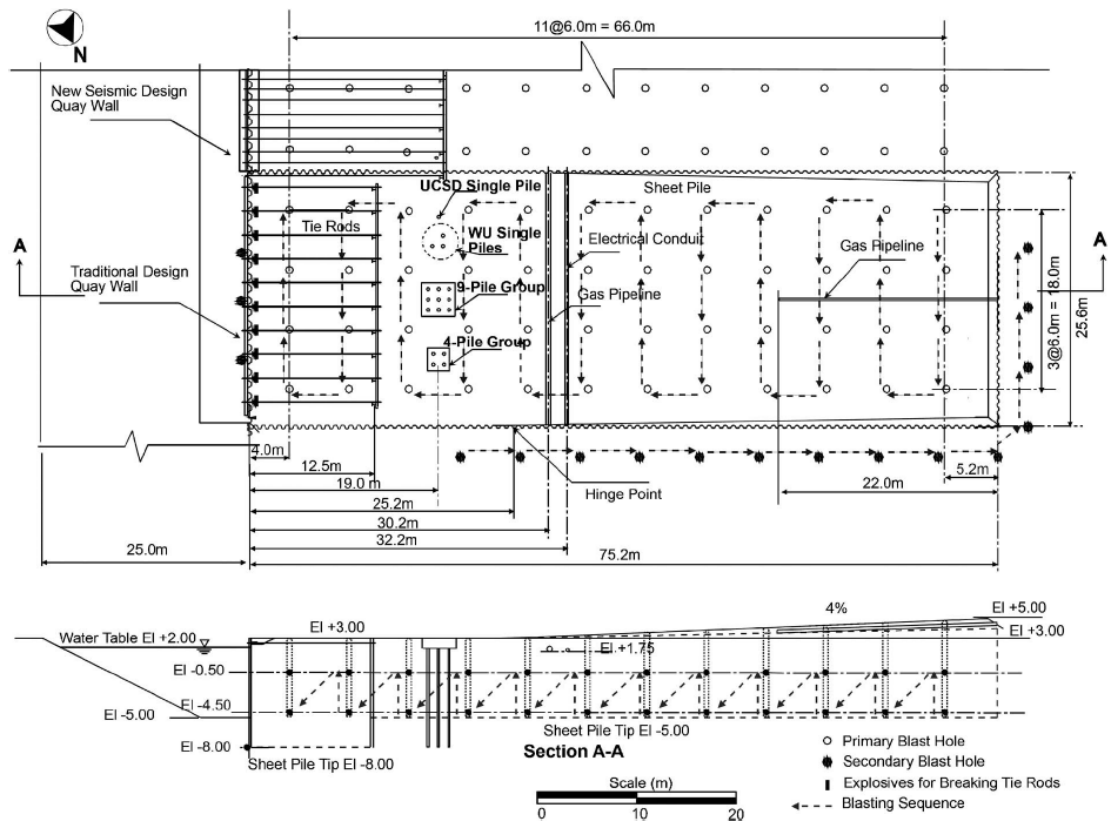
Blasting Layout and Sequence during Tokachi Full-Scale Blast #1
